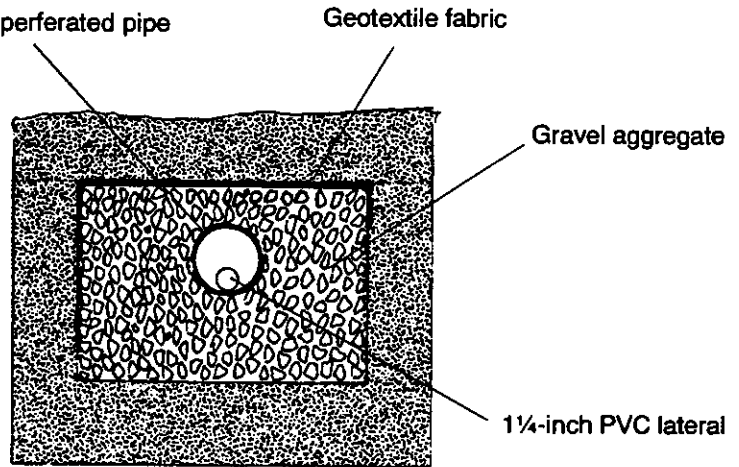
Cross-sectional, profile detail of recommended LPP trench.
